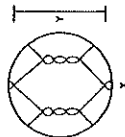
WIRE MESH DIMENSIONAL LAYOUT
